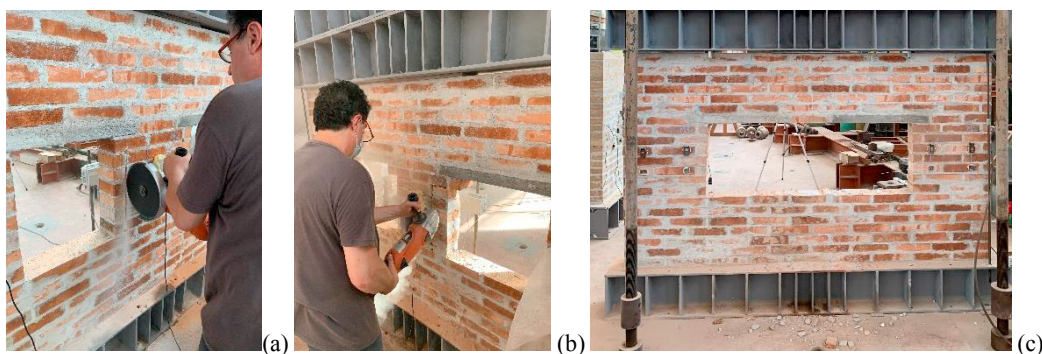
Damage simulation in the central wall: (a) first cross-section reduction; (b) second cross-section reduction; (c) central wall removal.
